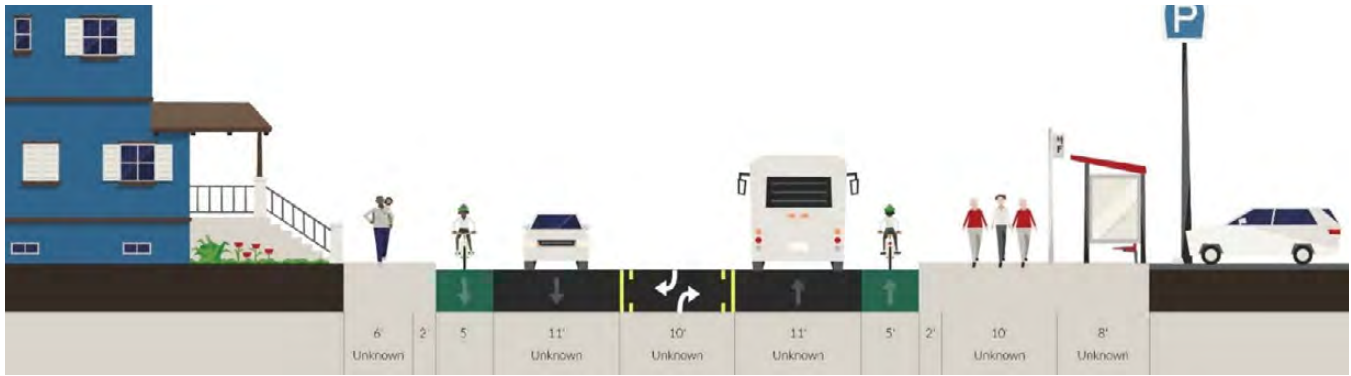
Cross Section: McGill Ave. – Irish Buffalo Creek to Rail Road (Downtown Boundary)
